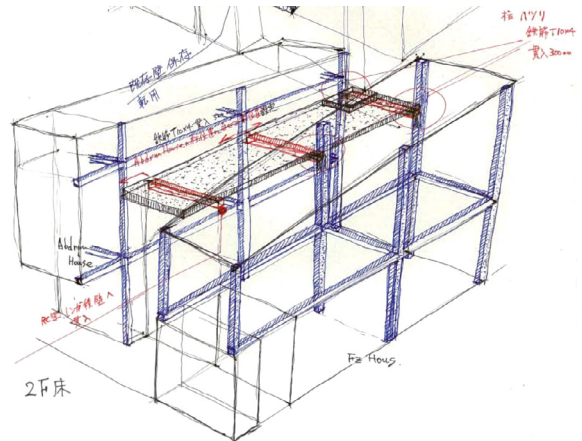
Initial Design for Local Learning Center: Putting a Floor on New Beams which Connect Existing Structures
